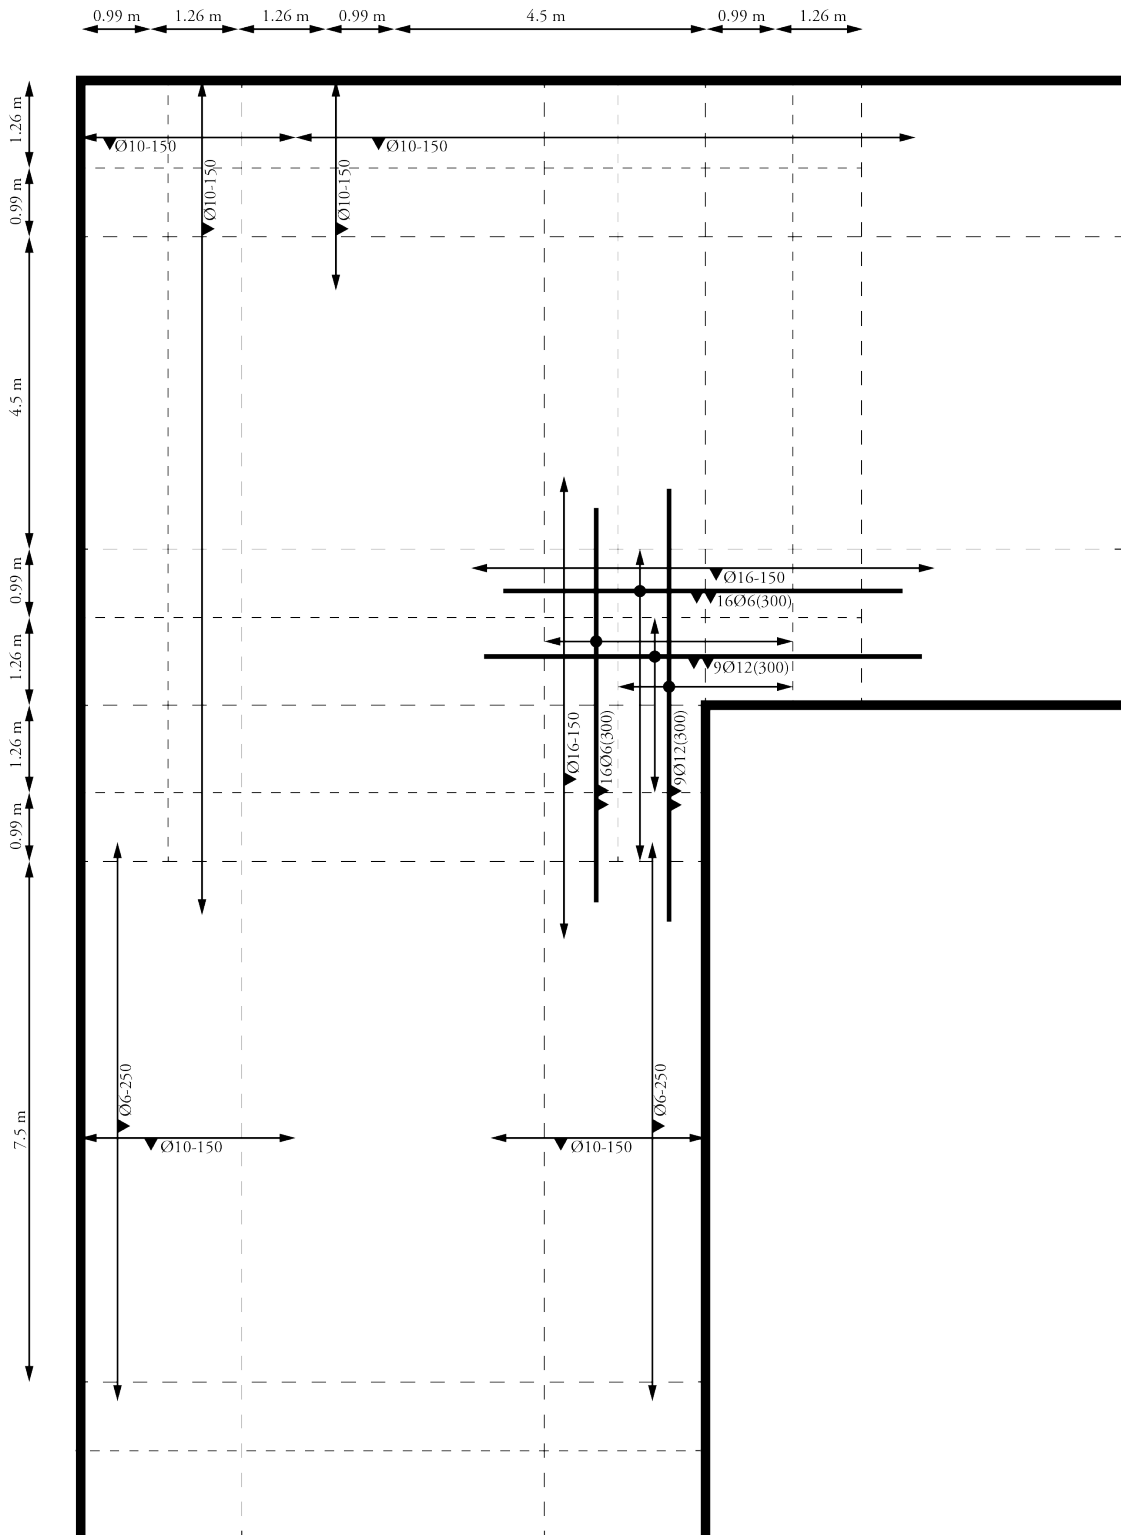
Reinforcement drawing of the top reinforcement in the flat slab floor for the 150-meter models.
